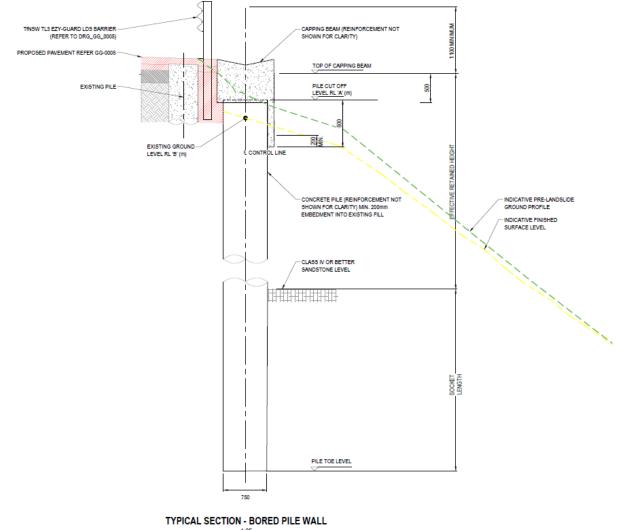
for a cross-section of the proposed cantilever piled wall.
